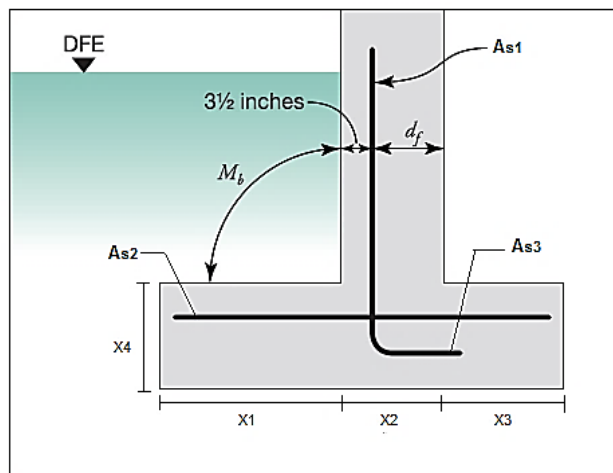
Cantilver flood wall geometry dimensions and design variables [1]
